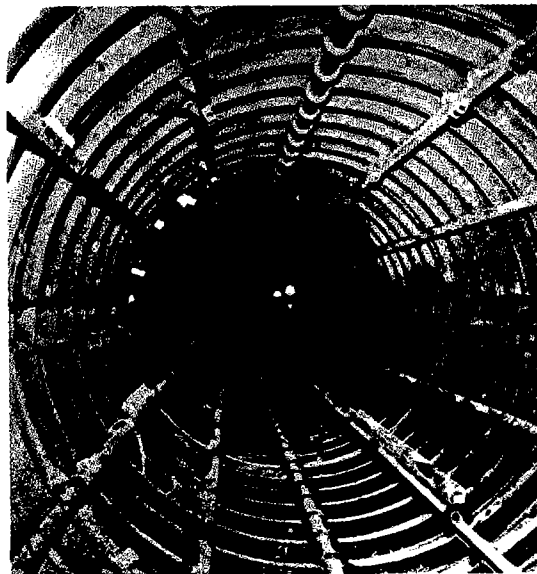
Mounting of the cages on adjustment bolts and fastening of vibrators
